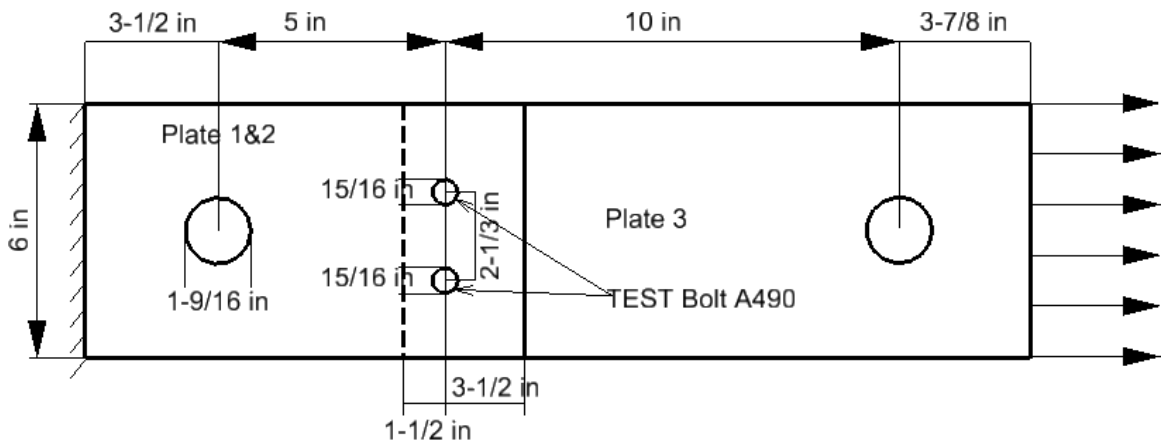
Twin-bolt connection setup and dimensions of Yu's test (Not in scale)
